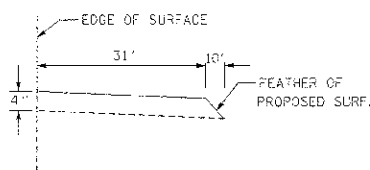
DETAIL OF BUTT JOINT STA. 331+17.5 & DETAIL OF INTERSECTION 330+63 RT
